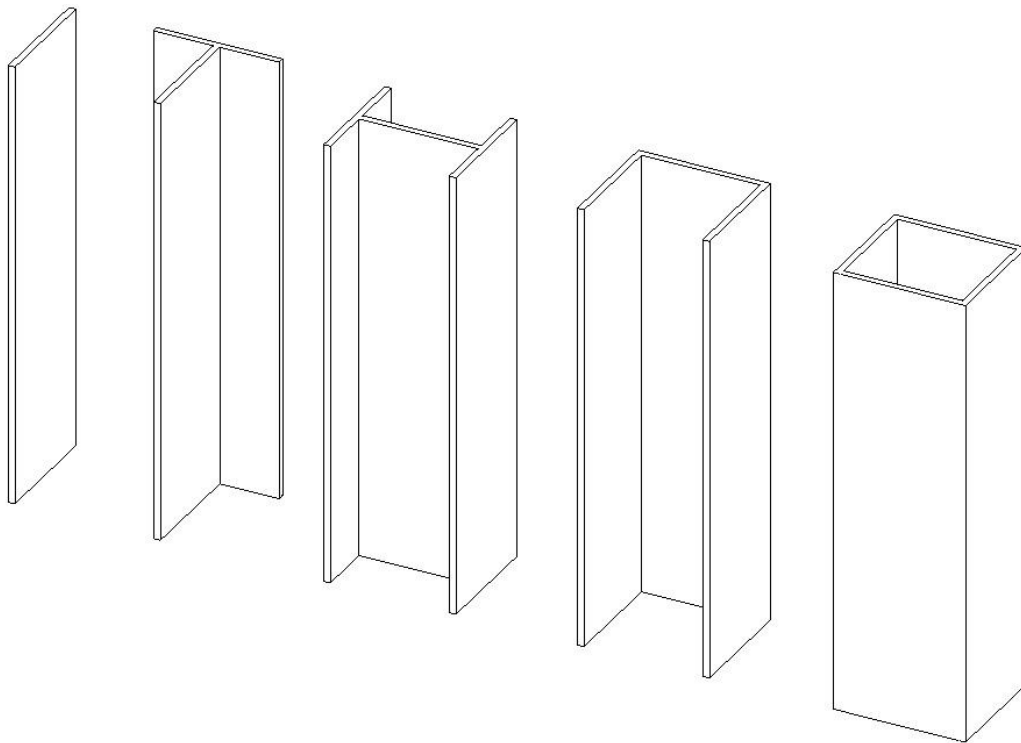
Examples of individual shear walls and combined shear wall units. From left to right; Individual shear wall, T- unit, I-unit, C-unit, Core unit. Observe that these usually contain openings which are not shown in the figures.
